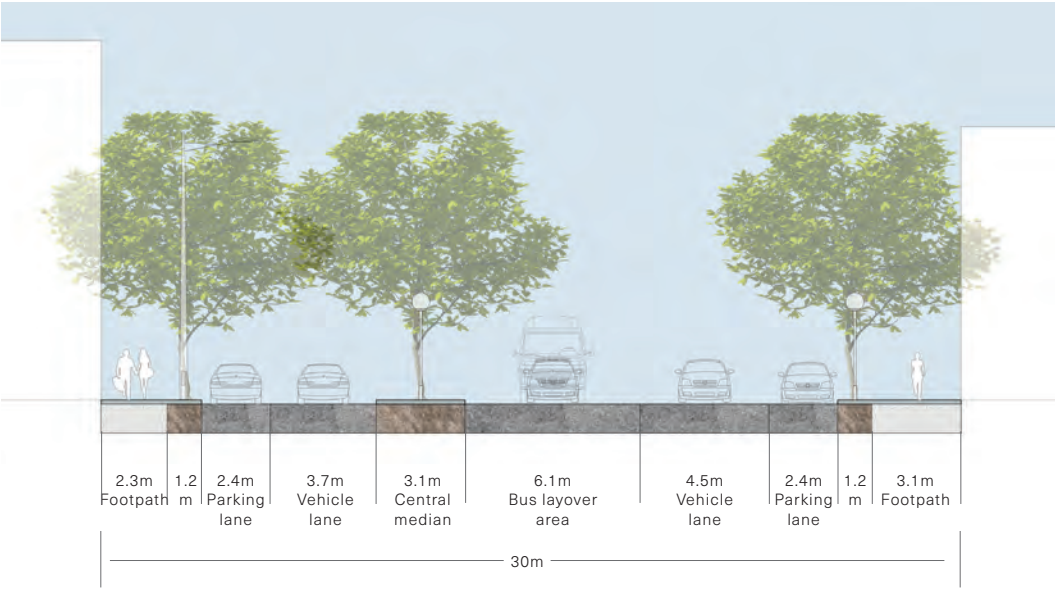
Gheringhap Street block 2 section A-A' showing the existing condition
